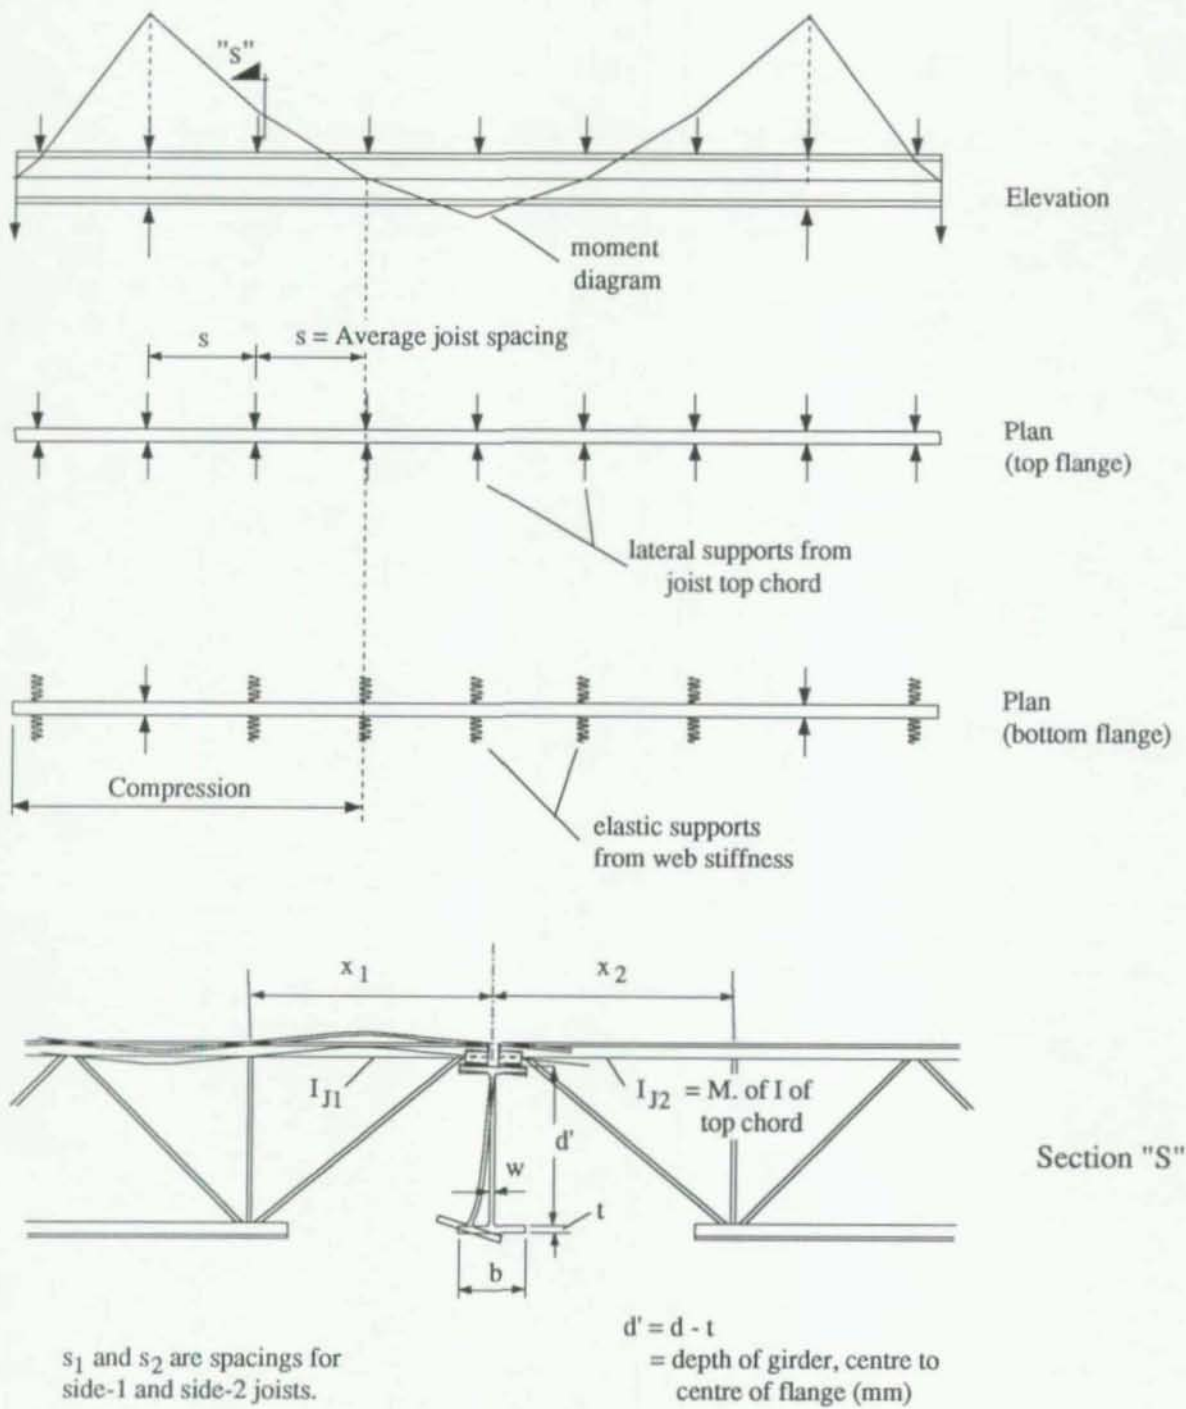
Cantilever Girder Stability Check for Slender Girders
